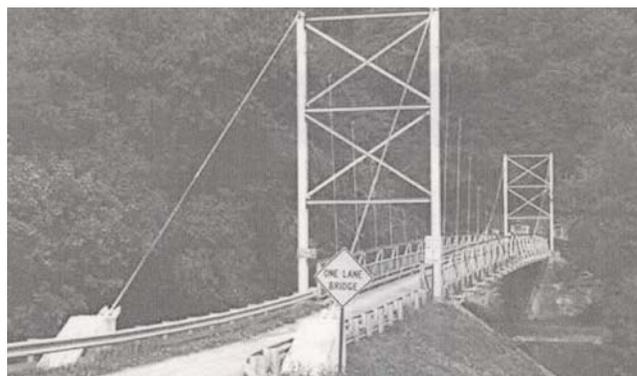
Corbin Bridge aluminum deck. (Source: www.aluminum.org/Content/NavigationMenu/The_Industry/Building_Construction_Market/Bridges/Bridges.htm.)
